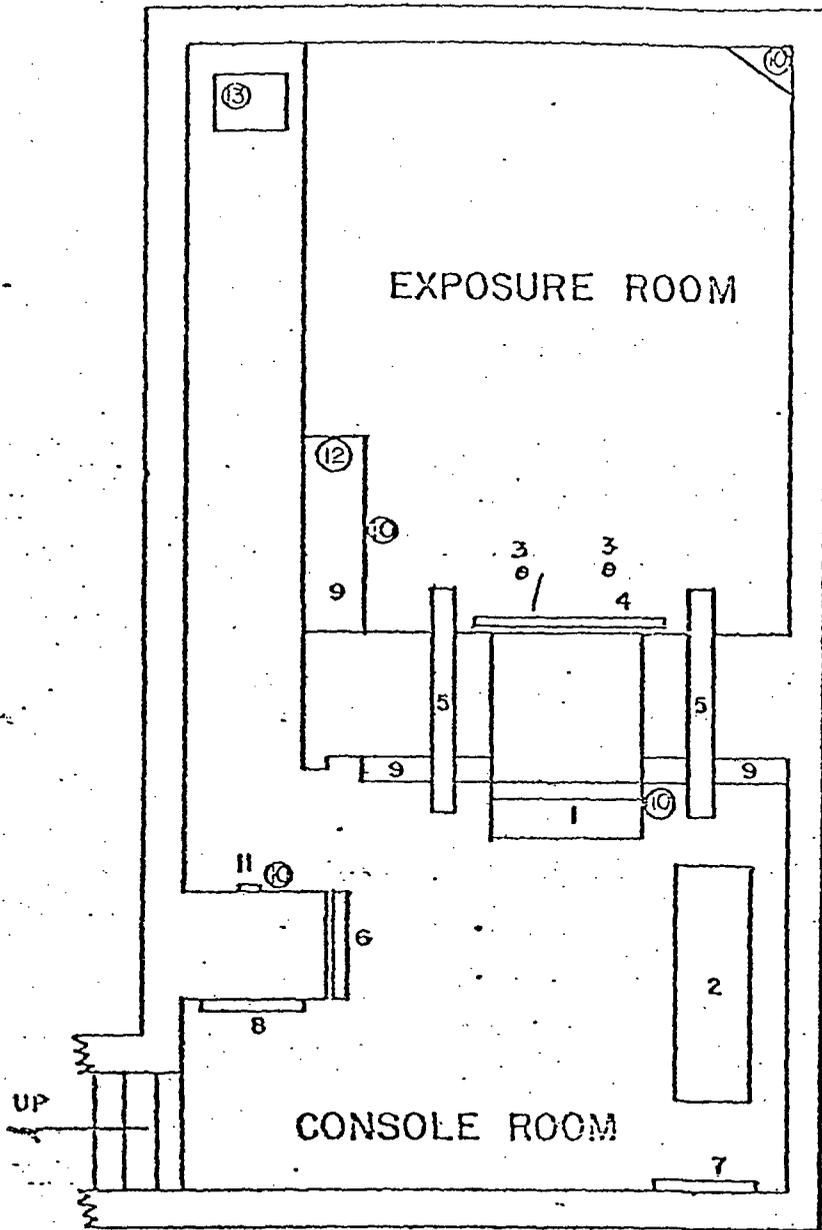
ELEVATION VIEW UNDERGROUND VAULT
